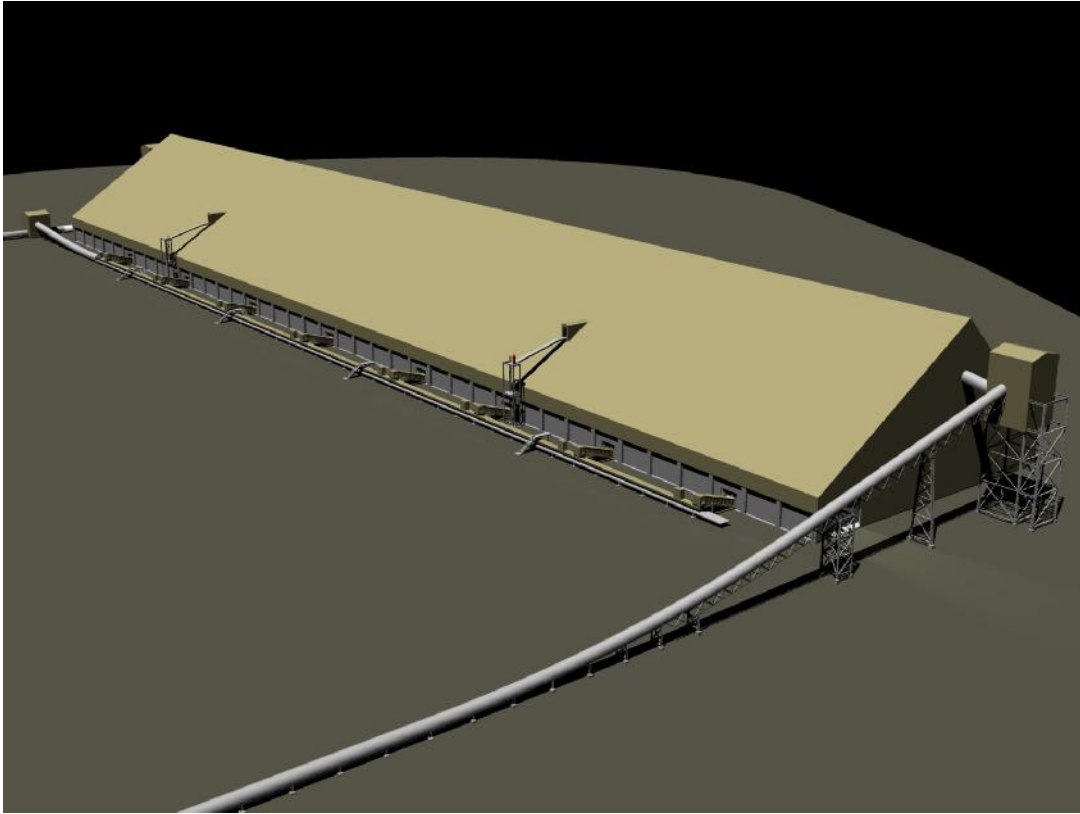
Conceptual layout of KCBX South Terminal after Construction
